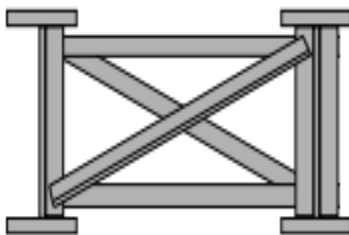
Cross-frame bracing (FHWA Bracing Systems)
